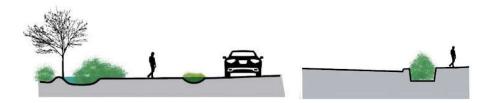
Typical Section of proposal of Green streets (Left and Retention Alley (Right)
